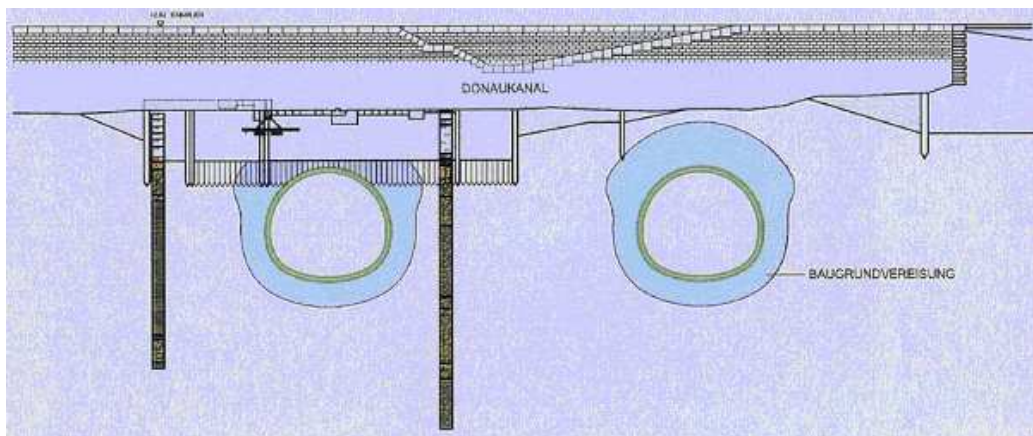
Cross-section of the ground freezing construction site U2/1 "Schottenring", Vienna, Austria
